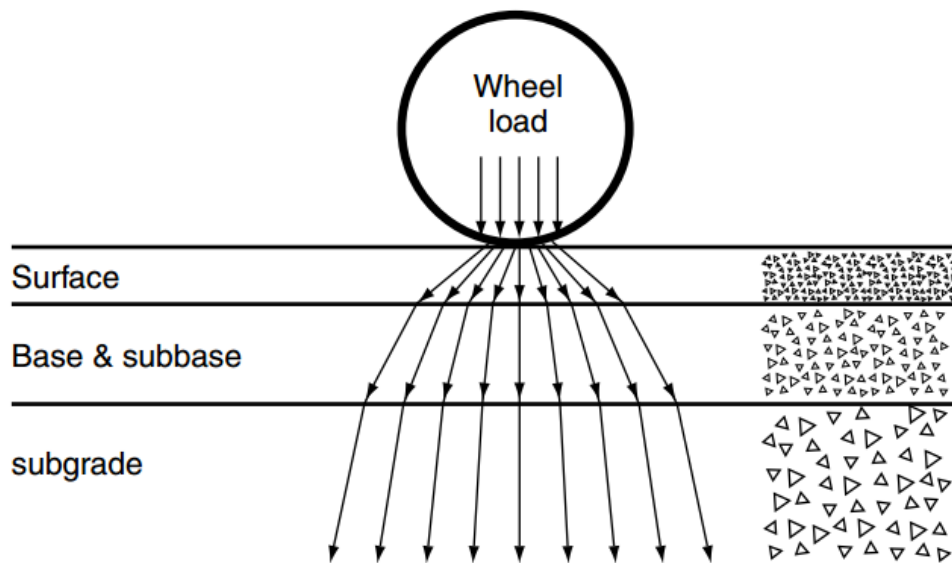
Load distribution in flexible pavement (Mamlouk 2006).
